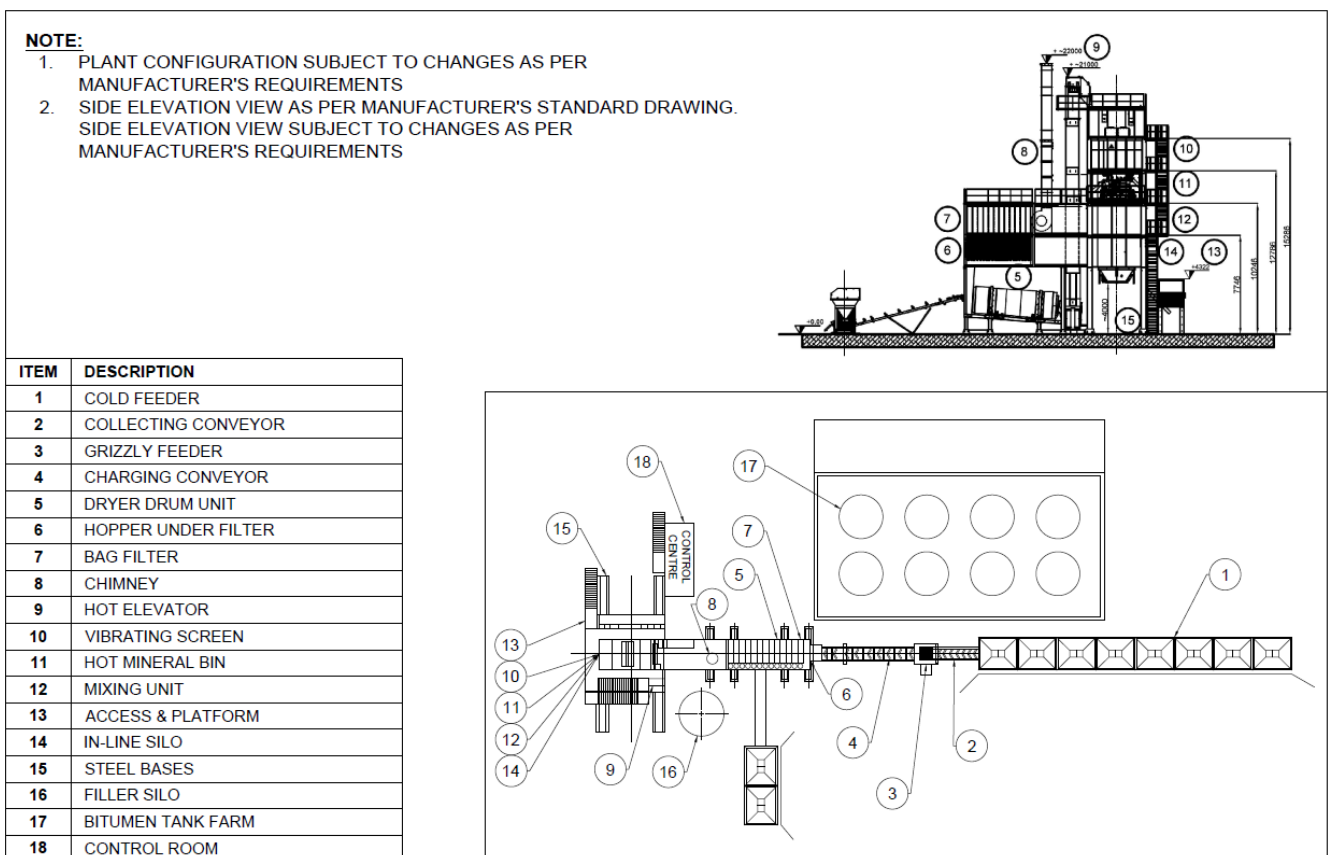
Plan and elevation view of the proposed asphalt batch plant
